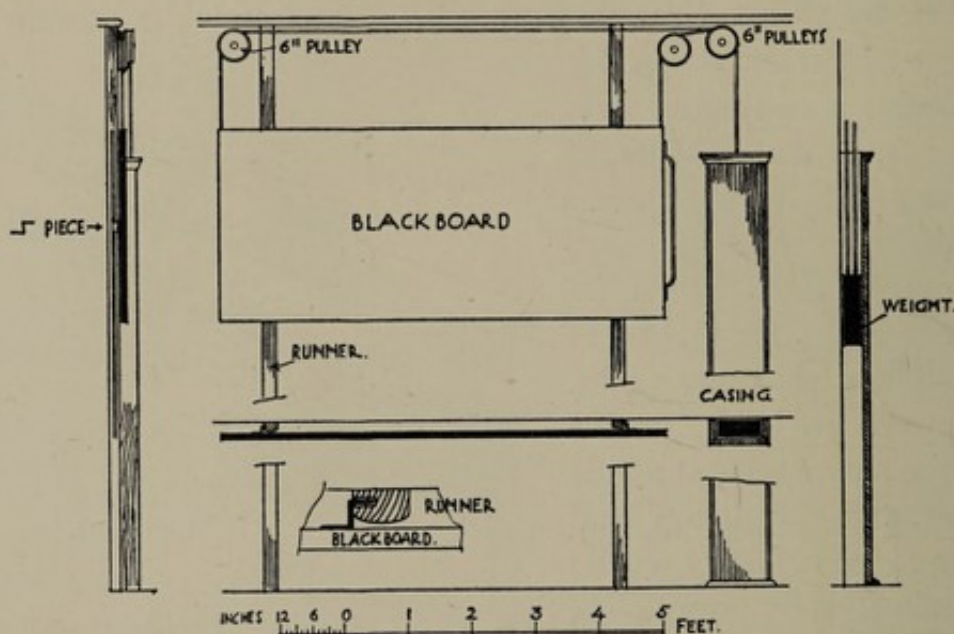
Elevation, Plan, and Sections, Kelvin-hung Blackboard.
